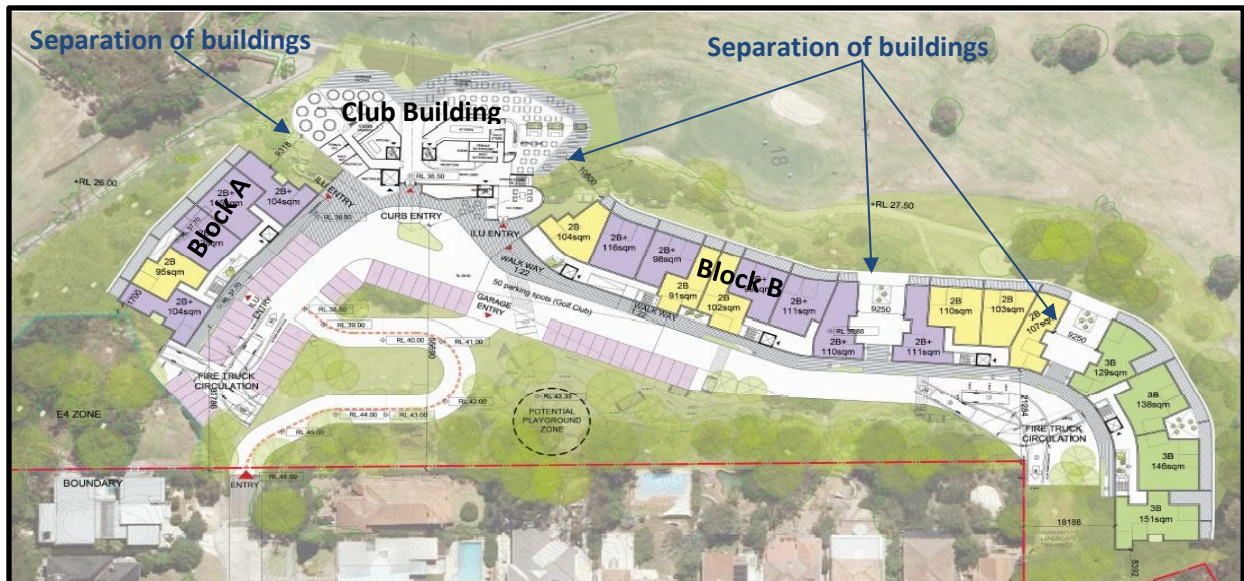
Level 3 plan illustrating separation between Club building and Blocks A and B.
